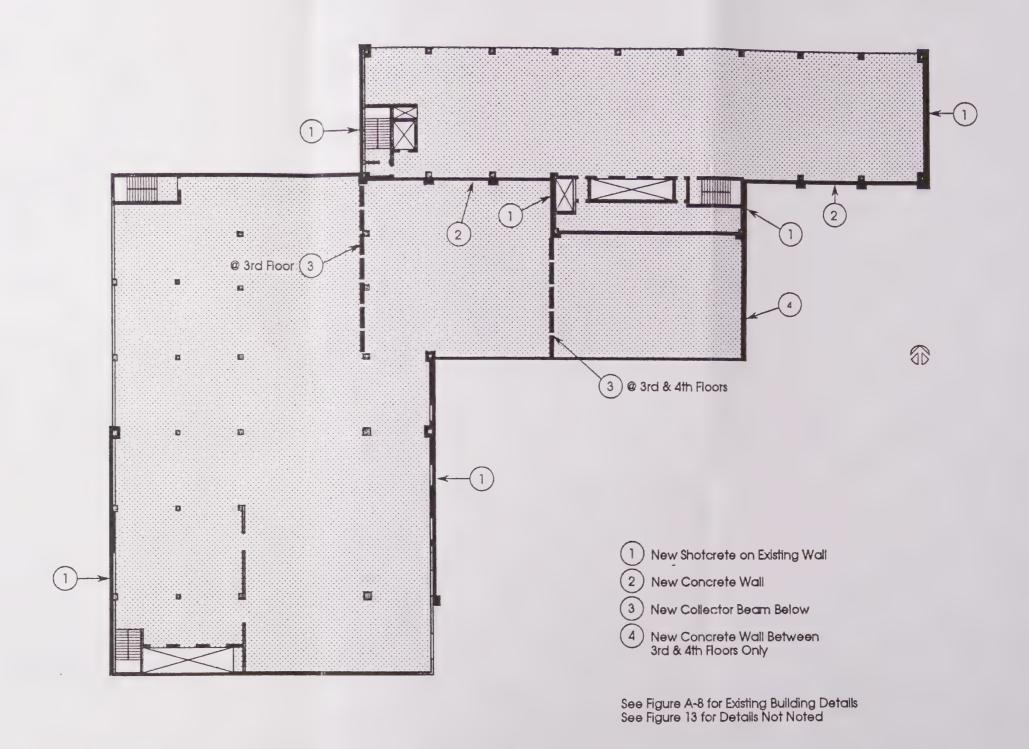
Retrofit Scheme - 4th Floor Plan (Similar at 5th & 3rd Floors)
